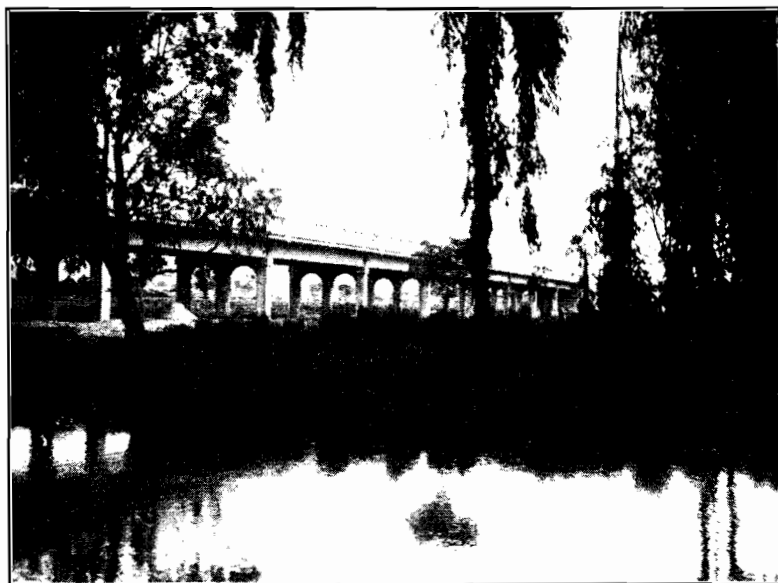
Showing second reinforced concrete Bridge 550 feet long over Latrobe River near Rosedale.
